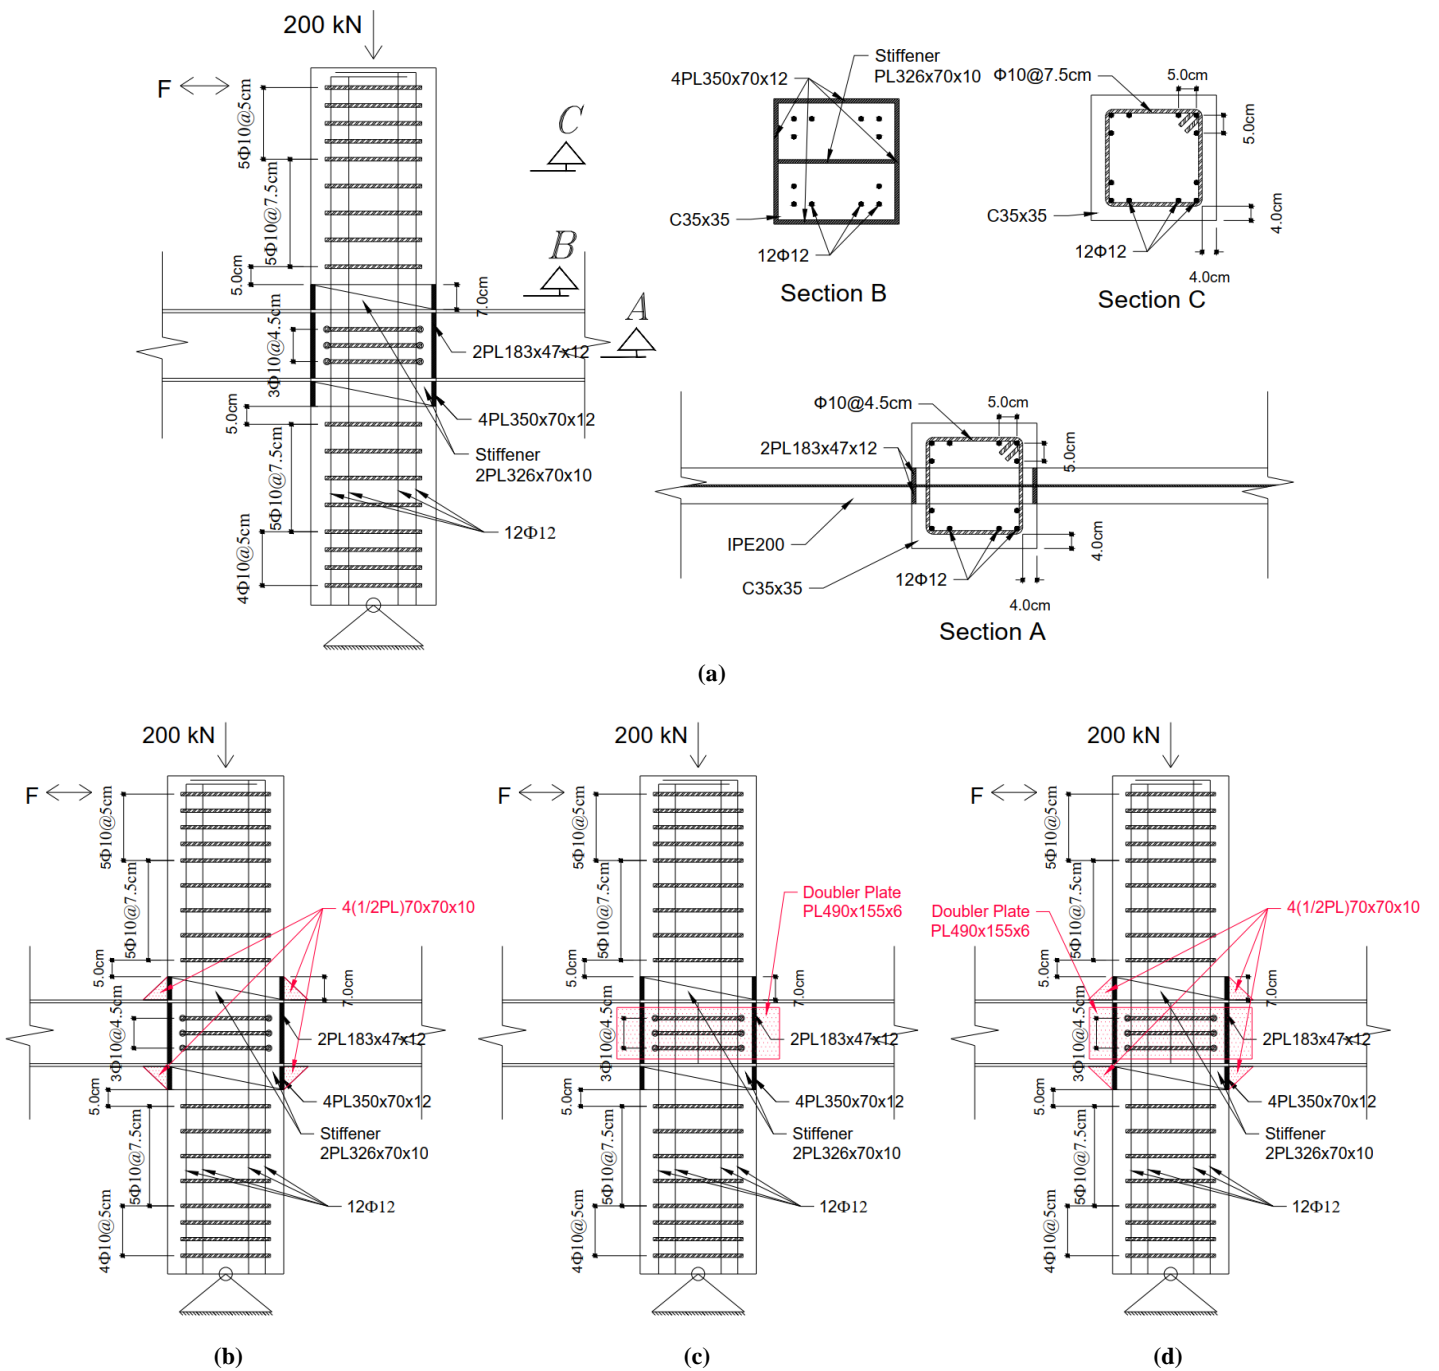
Design details of the RCS connections evaluated in this study, (a) Specimen #1, (b) Specimen #2, (c) Specimen #3, and (d) Specimen #4
